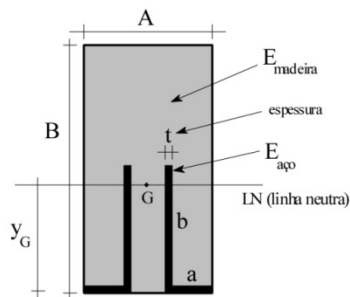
Geometric parameters and cross-section of reinforced beams (87)
